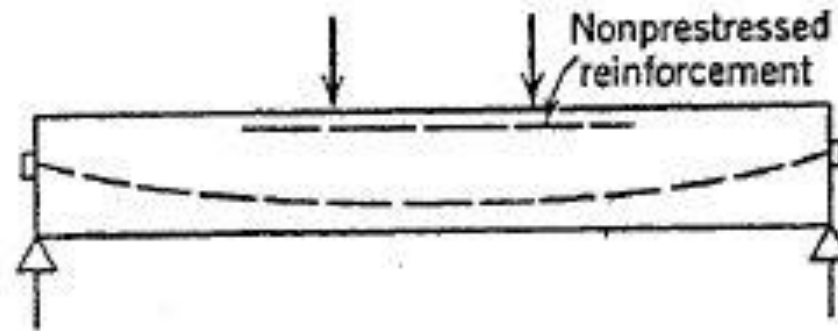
Nonprestressed reinforcements to strengthen beam just after transfer of prestress.
